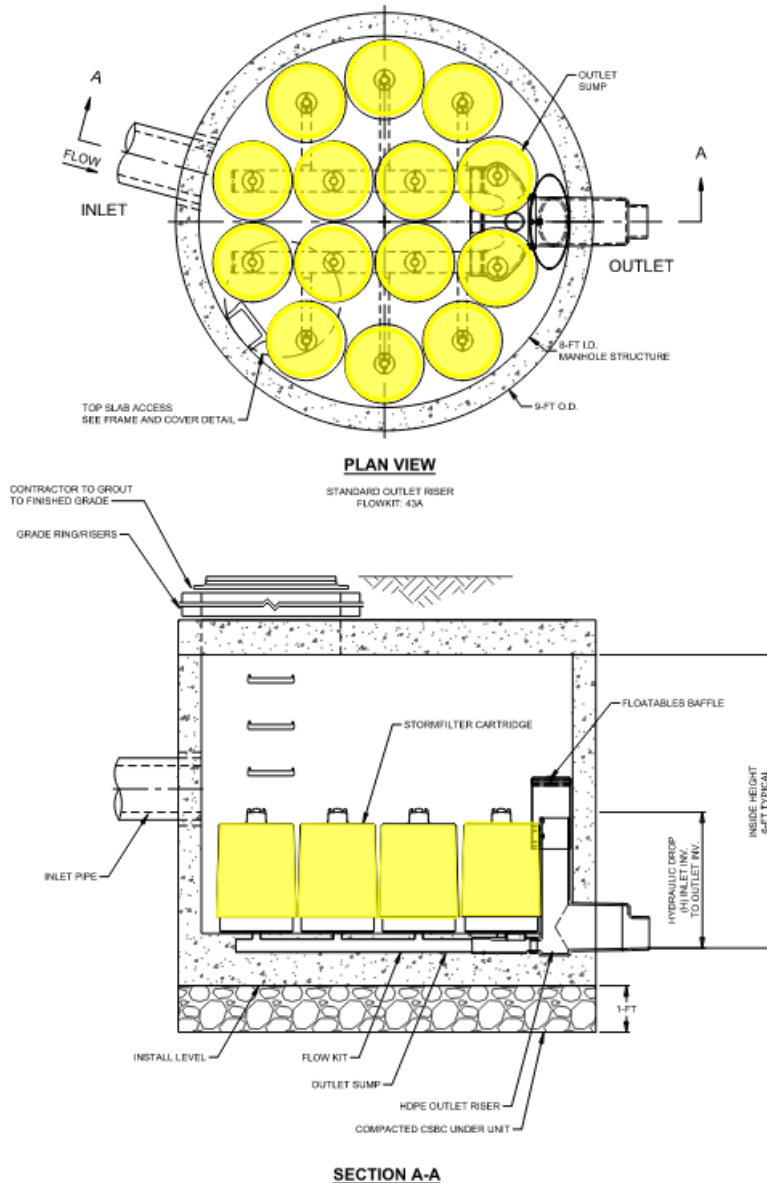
StormFilter Facility Details: 8-foot Diameter Manhole (WQ-3 and WQ-4)
